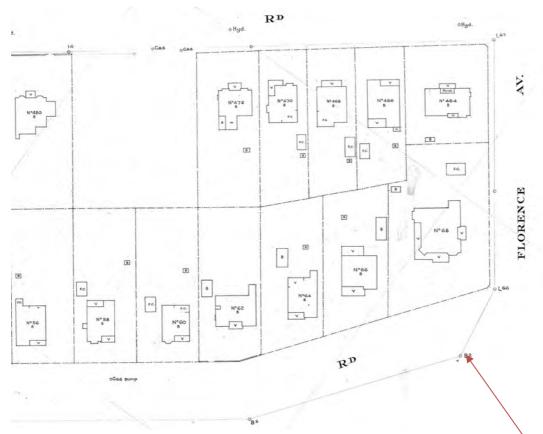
Closeup of the site at 68 Denistone Road from the 1930s sewerage plan above, with subject site arrowed. Note this shows the garage off Florence Street constructed in 1926 and a brick outbuilding (WC) in the northern corner. Source: Ryde Library Service
